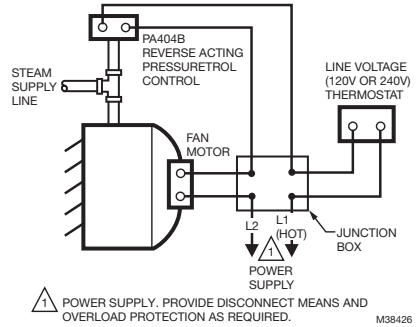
Typical connections for a PA404B used in a unit heater installation.
